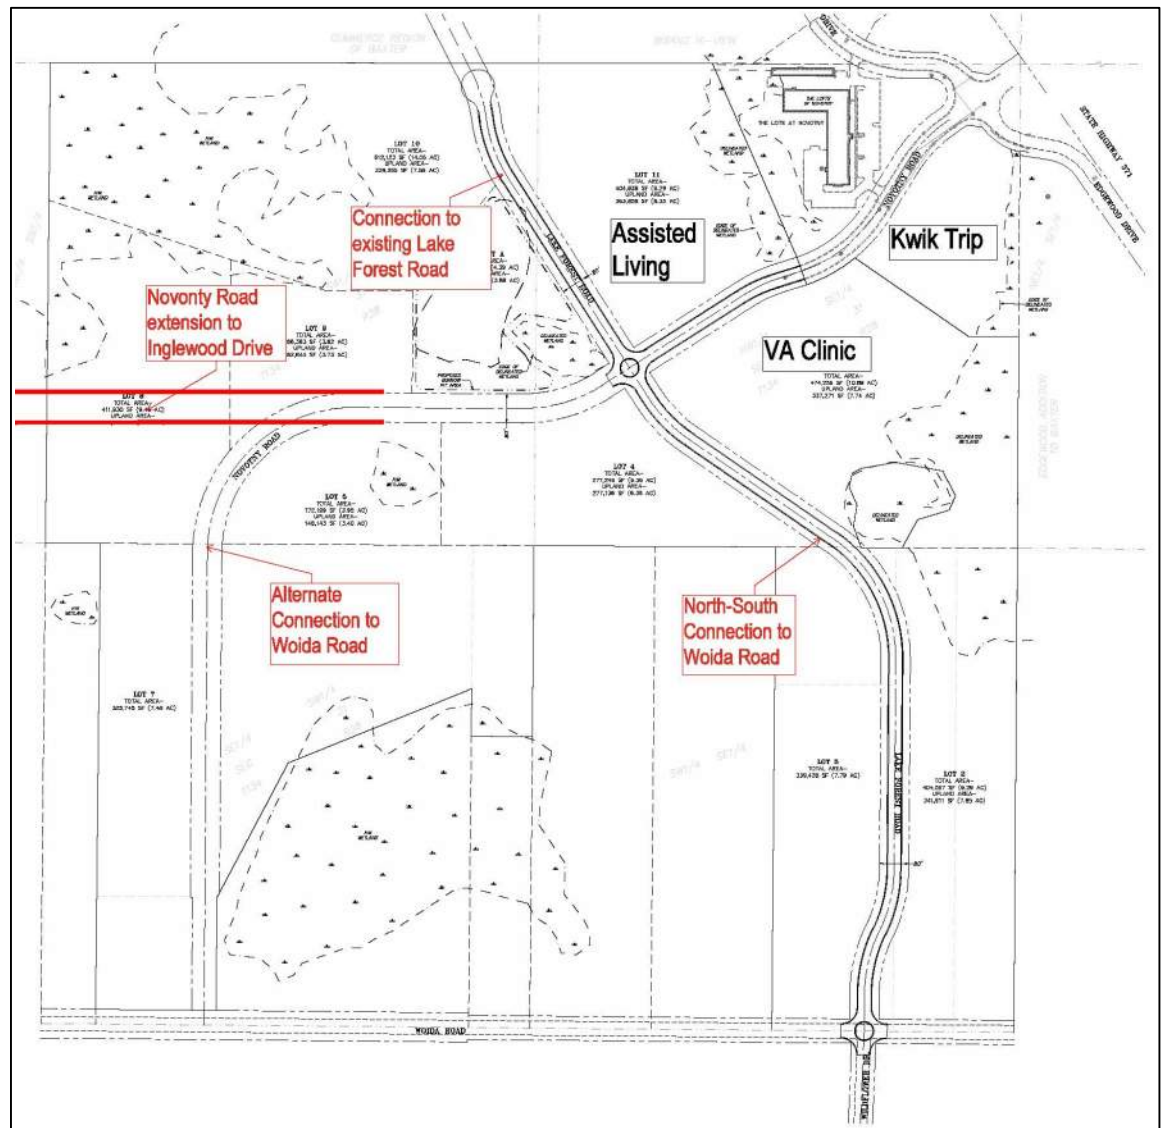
shows the long-term roadway connection plans for the development area on the west side of TH 371 between Woida Road and Lake Forest Road.
